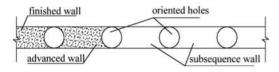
The "two-drill-one grab" method for the construction of the diaphragm wall (Lui, T. et al 2008).
